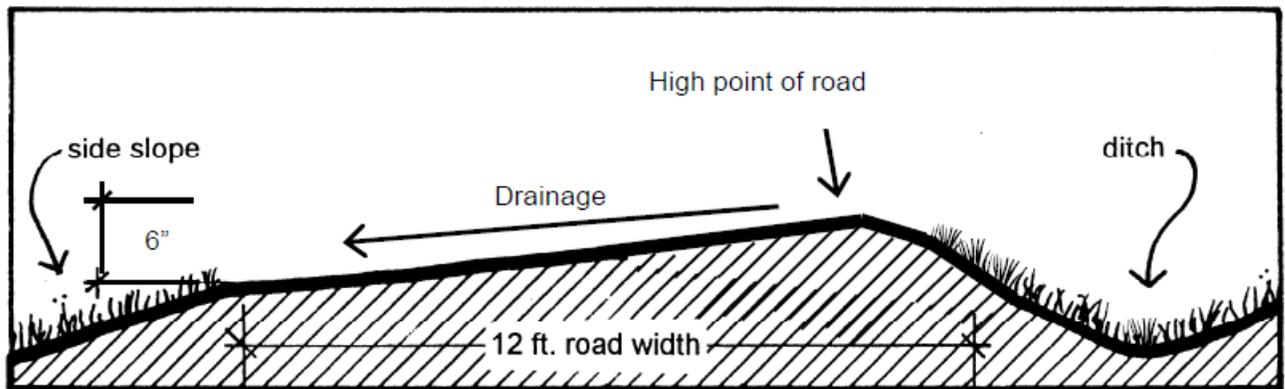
Super-elevation profile: 1/2 " of super-elevation per foot of road width (e.g., 1/2 " x 12' road = 6" crown).
